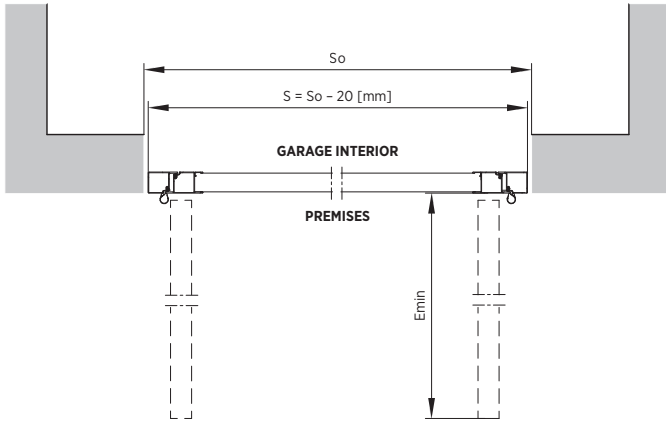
Installation in the opening – horizontal cross-section – Presto 50 double-leaf door.
